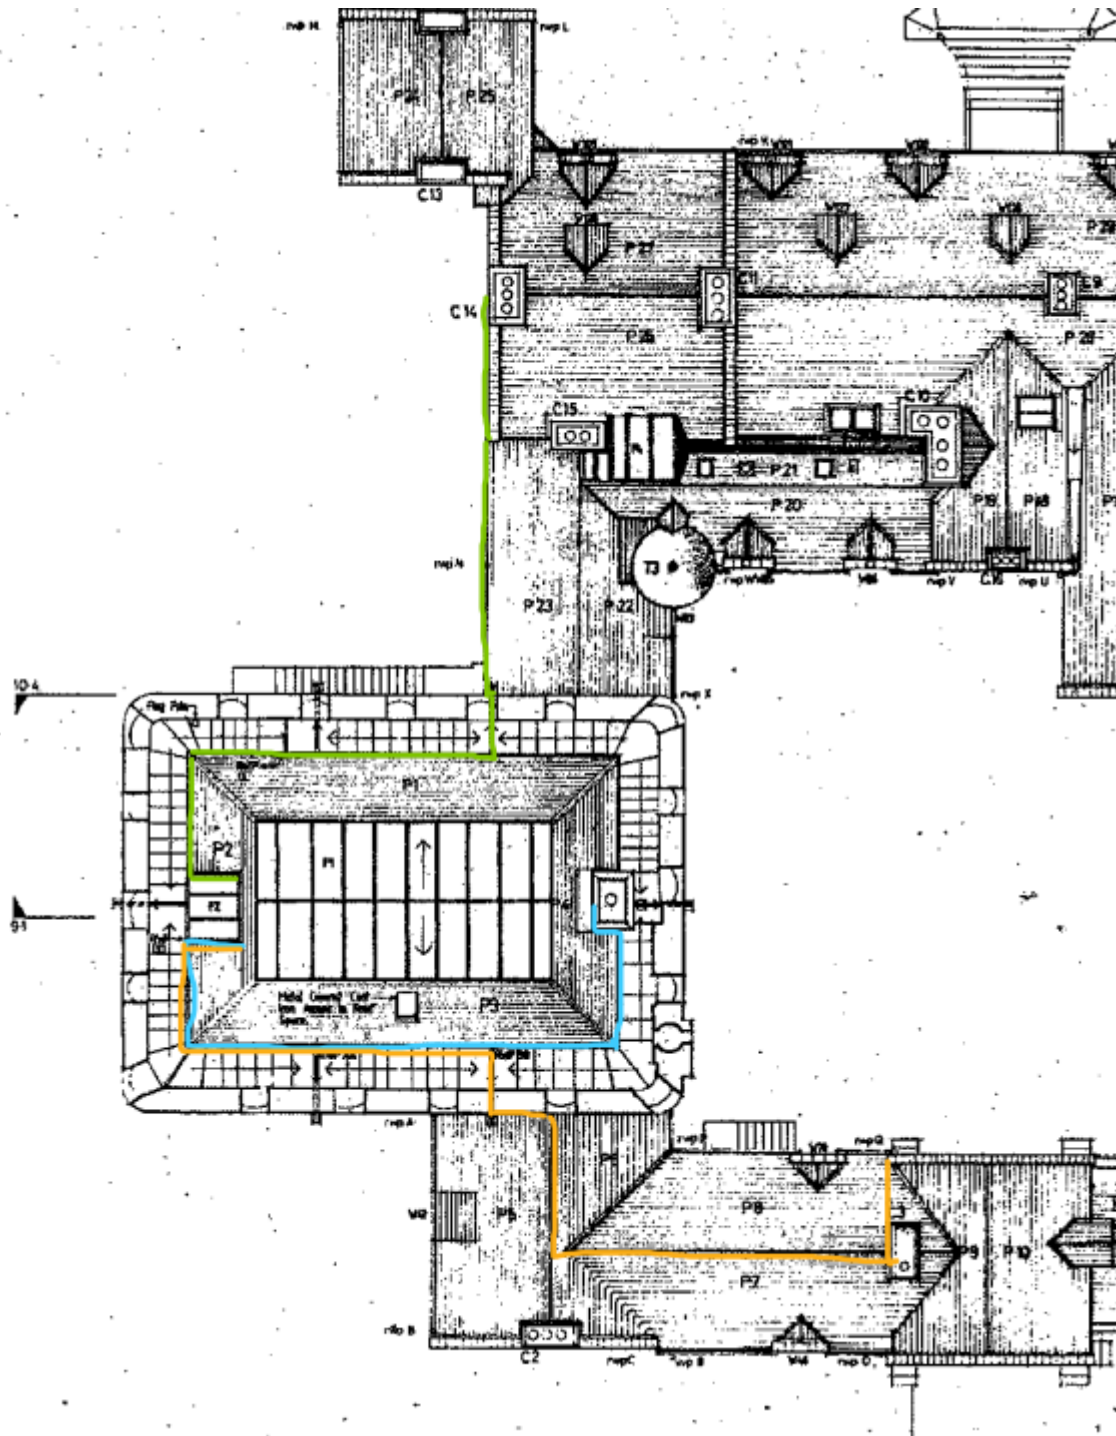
Roof plan extract (not to scale) with cabling routes shown.
